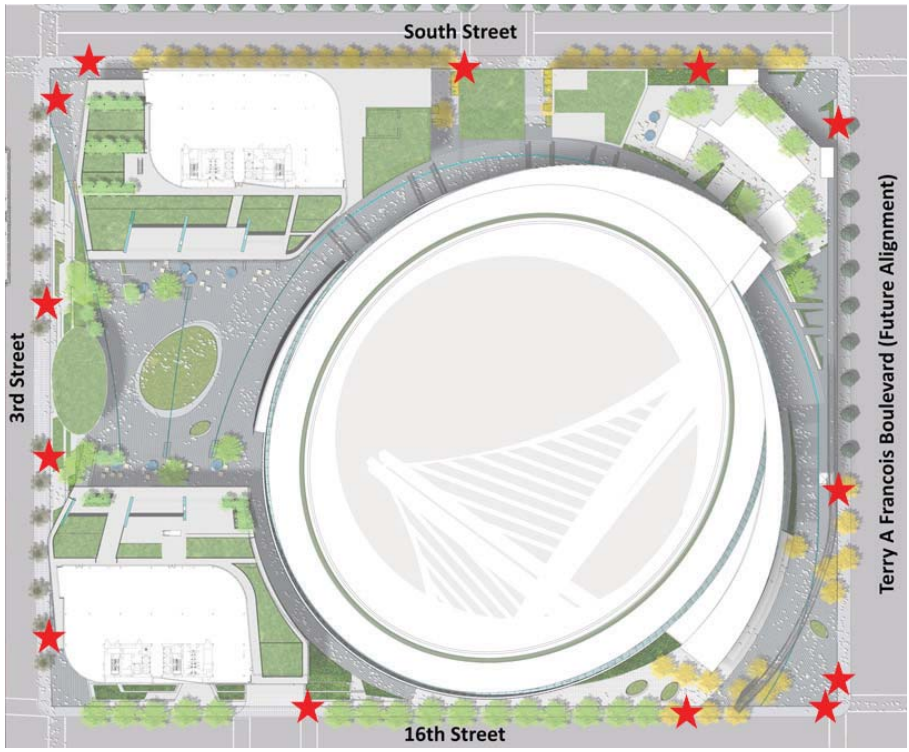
| Trash Receptacles (Mission Bay Streetscape Master Plan)
